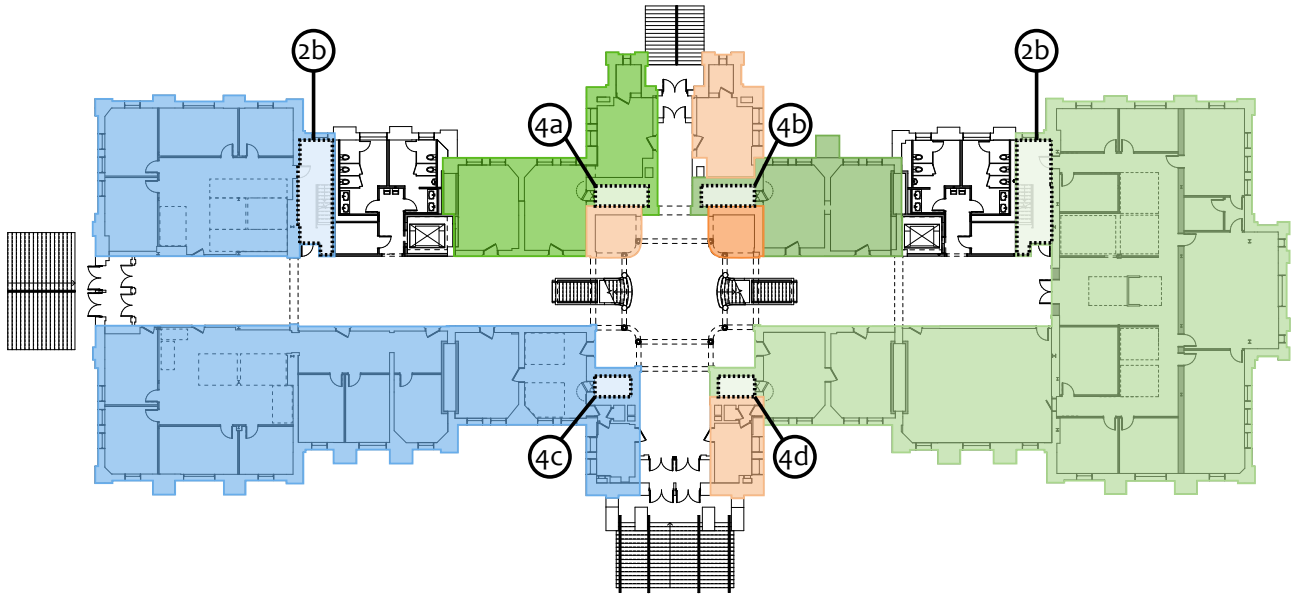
Proposed Space Allocation + Areas of Change - First Floor [Capitol]
